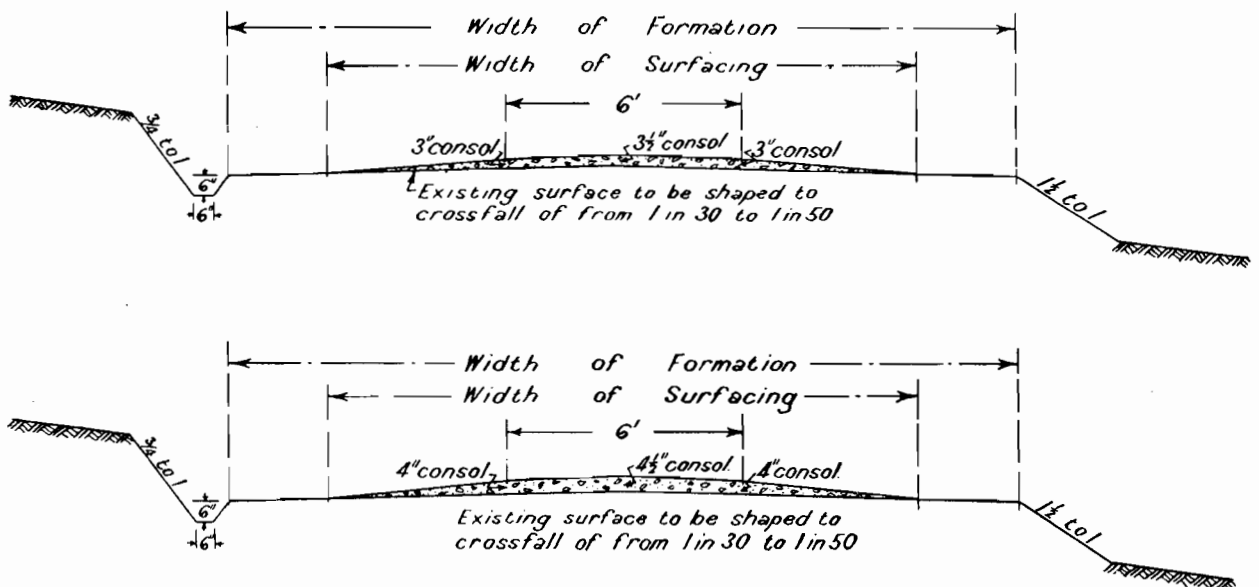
Type Cross Sections for Tapered Surfacing. Scale: 4 feet to 1 inch.
